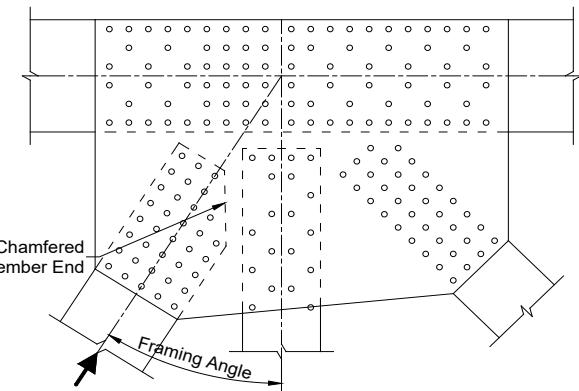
Example Connection Showing a Typical Chamfered Member End and Member Framing Angle
